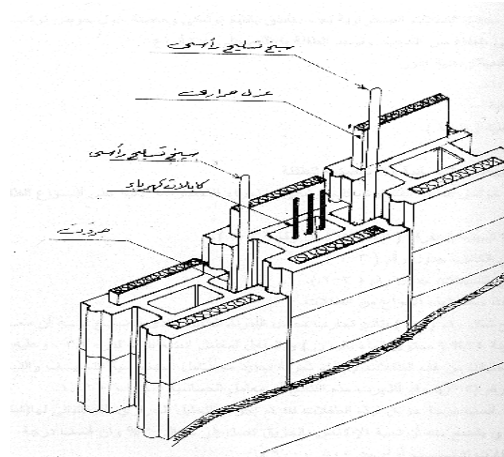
Wall Assembly Showing Unit Interlocking, Insulation, Piping and Reinforcing
